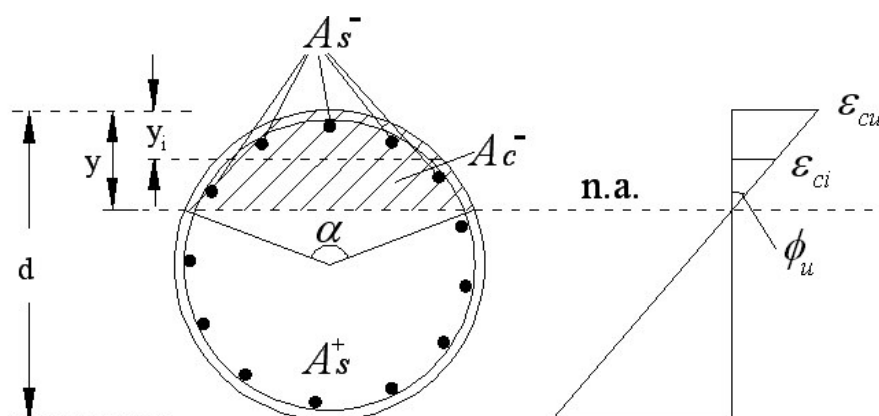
Circular Cross Section of FRP Confined Concrete Column.
